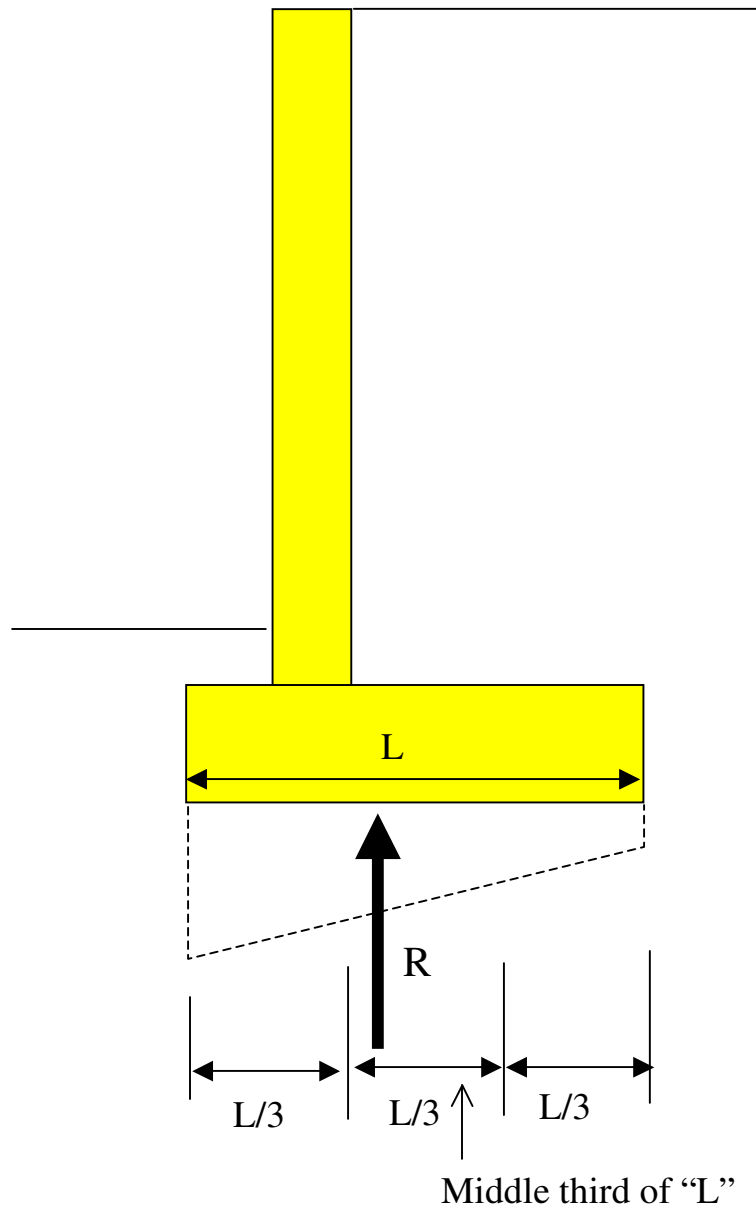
Overturning Failure of Cantilever Retaining Wall
